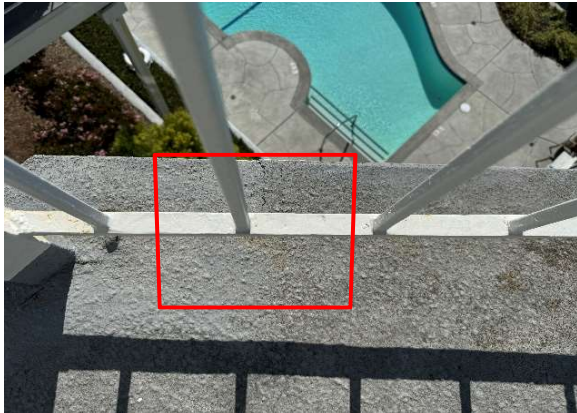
(24432): Expose top of plywood minimum of 3" beyond crack in all three directions.
